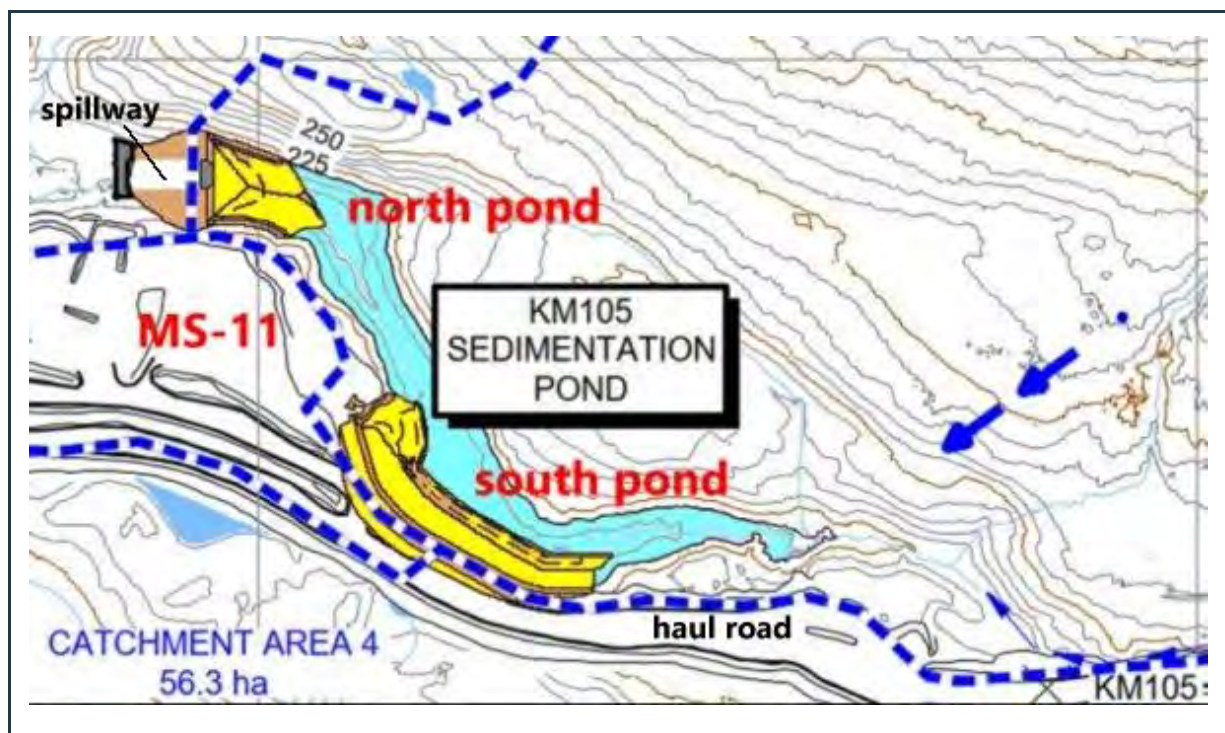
Site layout – Mary River Mine Site – South-Eastern Zone – KM105 surface water management pond /MS-11.
